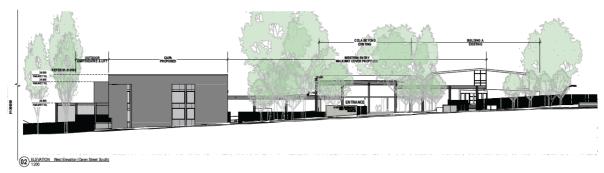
Approved Owen Street, CAPA/ Entry Streetscape
